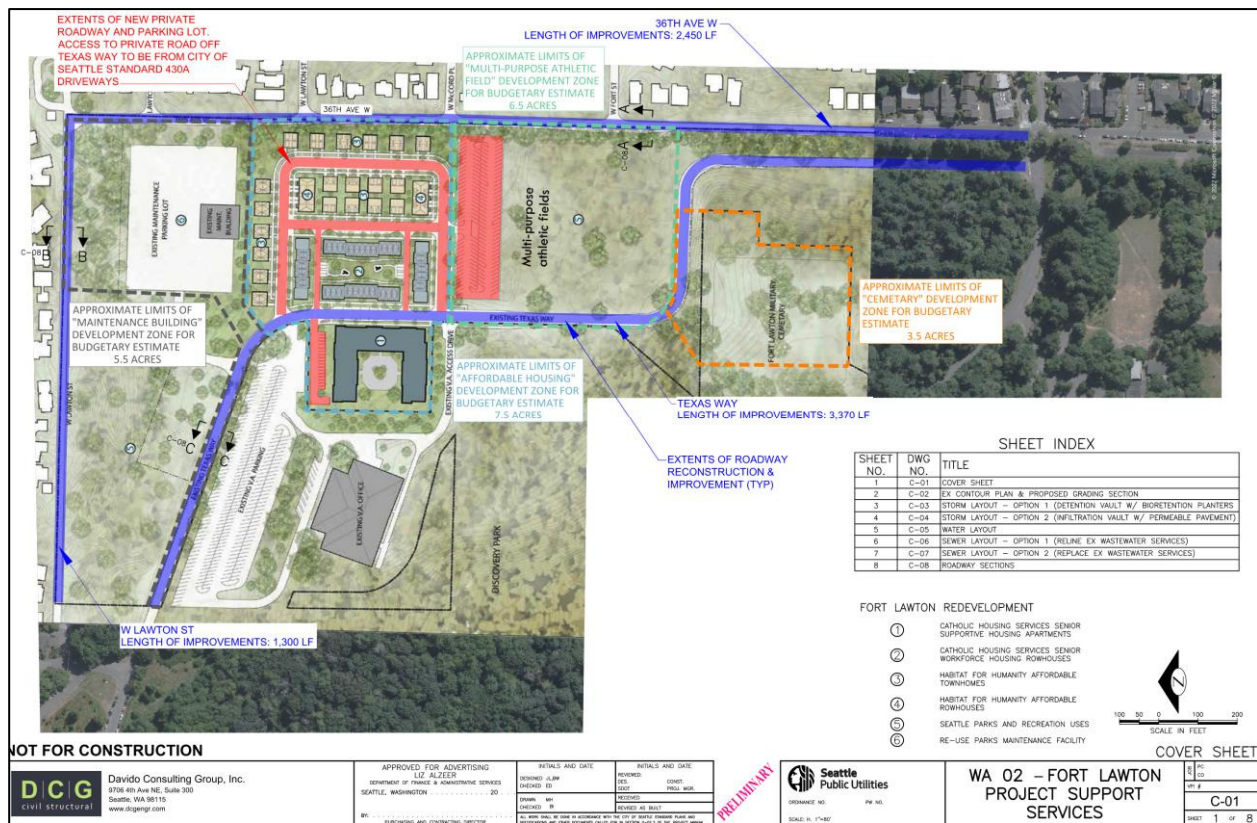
DCG Civil Site Plan from 2022 Estimate
